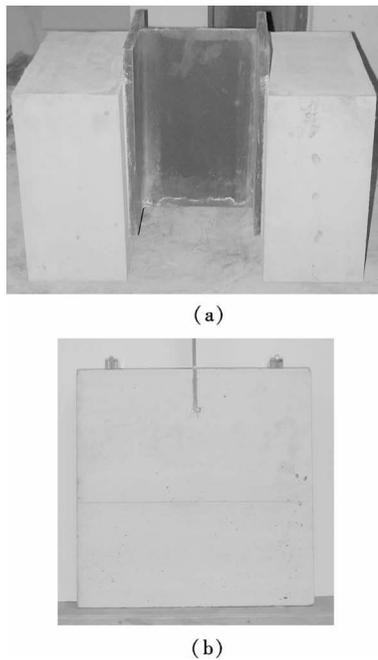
Geometry of steel/ECC connection specimens. (a) Pushout specimen; (b) Pullout specimen
